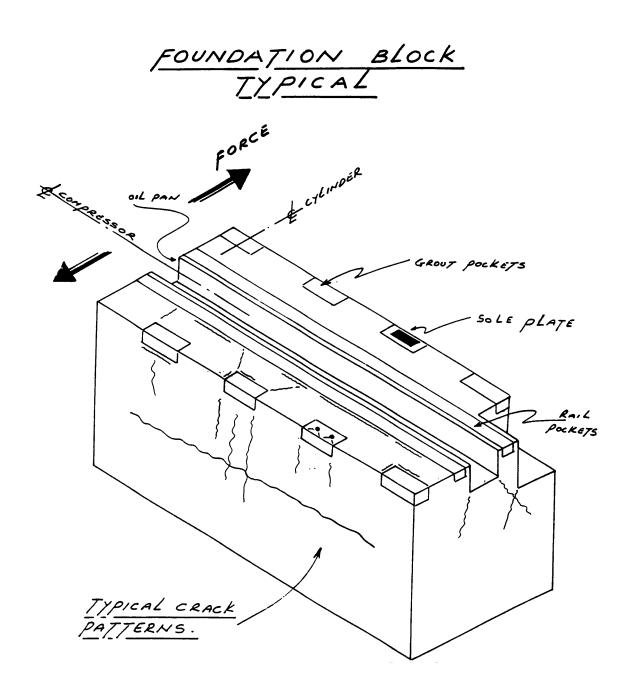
FOUNDATION BLOCK ISOMETRIC VIEW—COMPRESSOR AREA SHOWING GROUT POCKET AND SOLE PLATES
